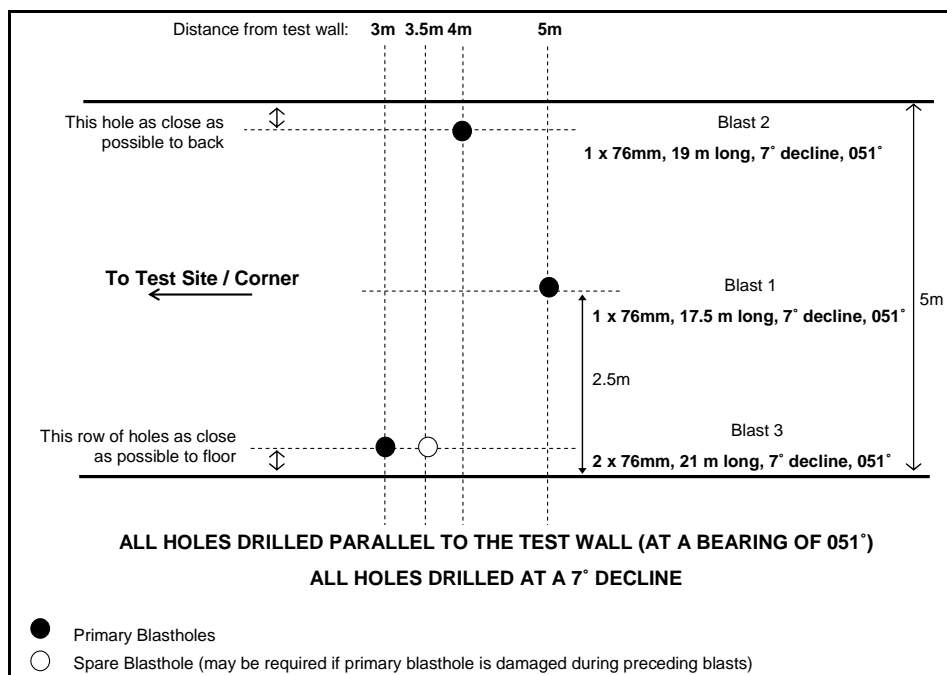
Blast hole drilling instructions from the Mt Charlotte test site. Blastholes were oriented parallel to the test wall, as shown in Figure 7
